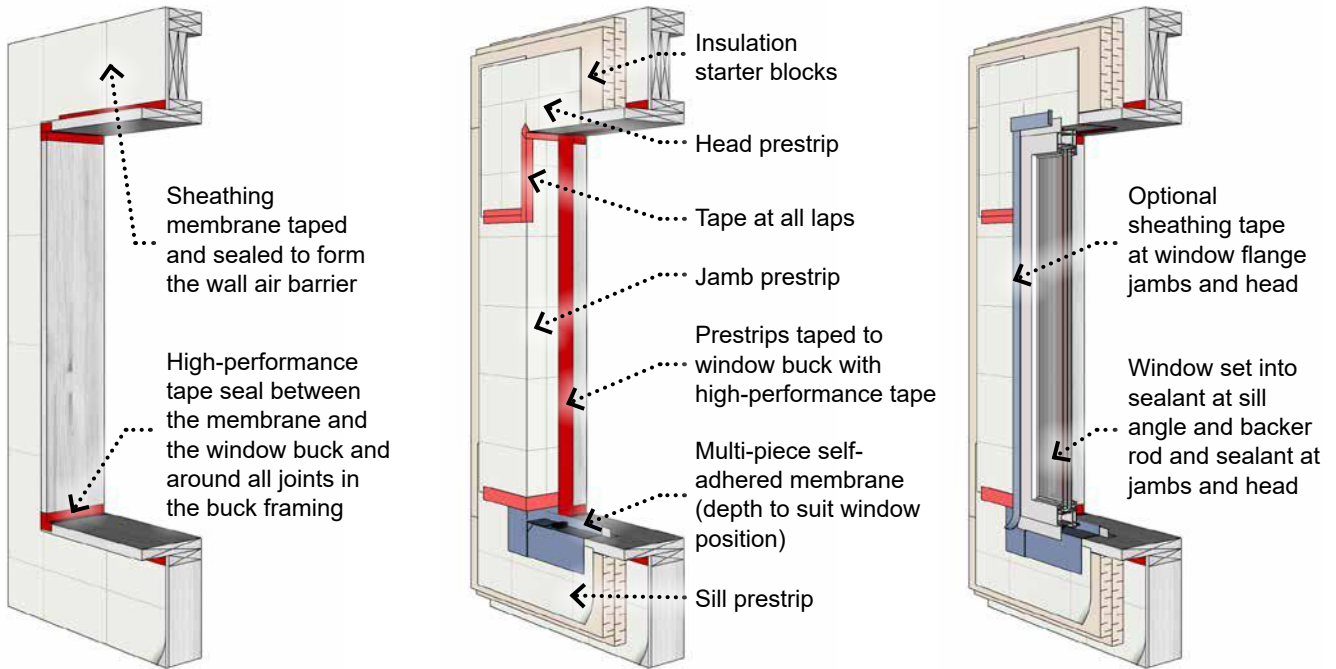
Rough opening window buck air sealing (left), prestrip membrane installation (centre) and flange window installation (right)
